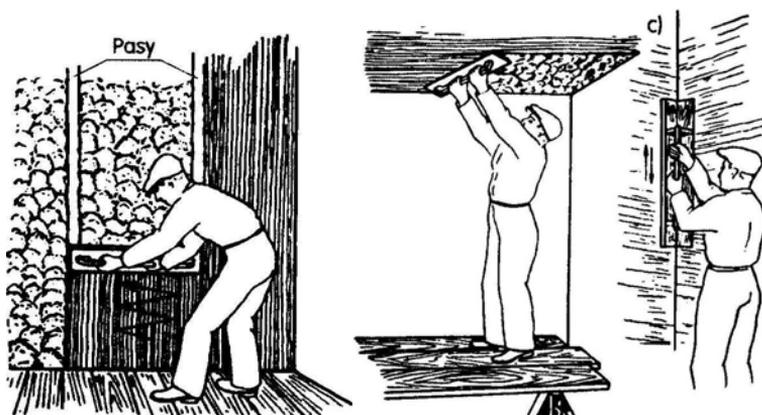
Leveling of plaster surface with a long float: a) on the walls, b) on the ceilings, c) in concave corners [13]
